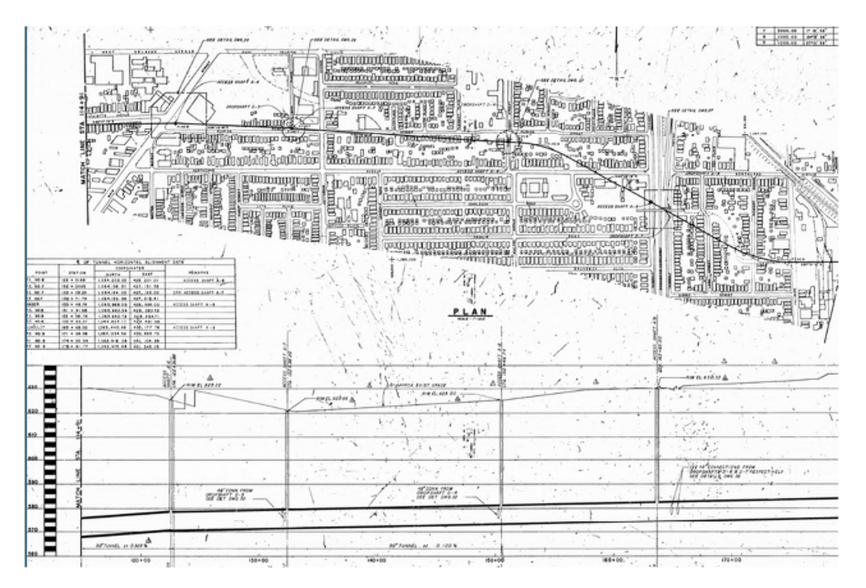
Existing Scajaquada Tunnel Interceptor Plan and Profile
